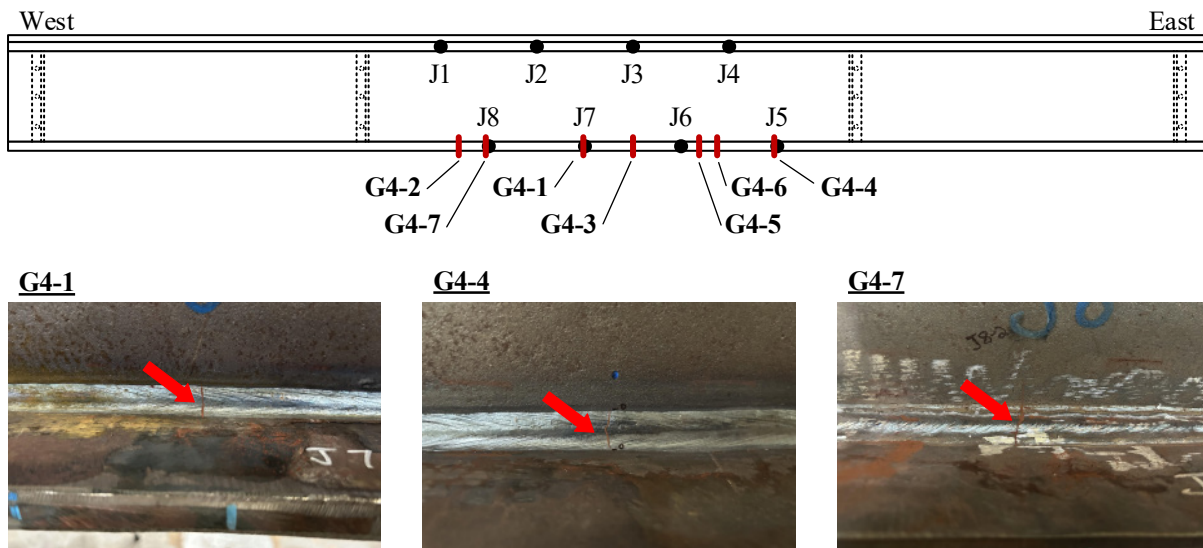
Illustration. Instrumentation layout for Girder 4 - Flange 1 (looking north).
